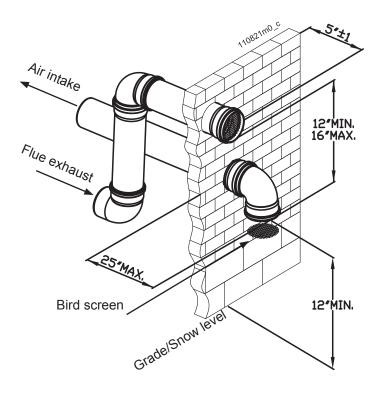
Two pipes sidewall termination of air and vent (if space permits)
